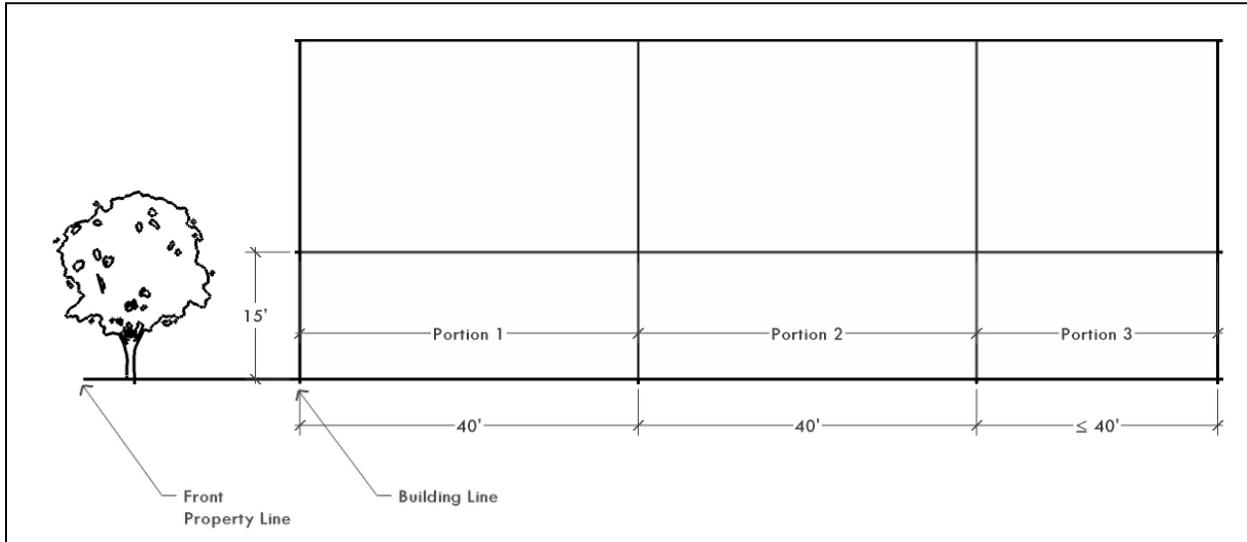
(Elevation View) Dividing Lot into 40-foot Portions to Create Side Setback Planes (Rear Setback Plane Not Shown)
